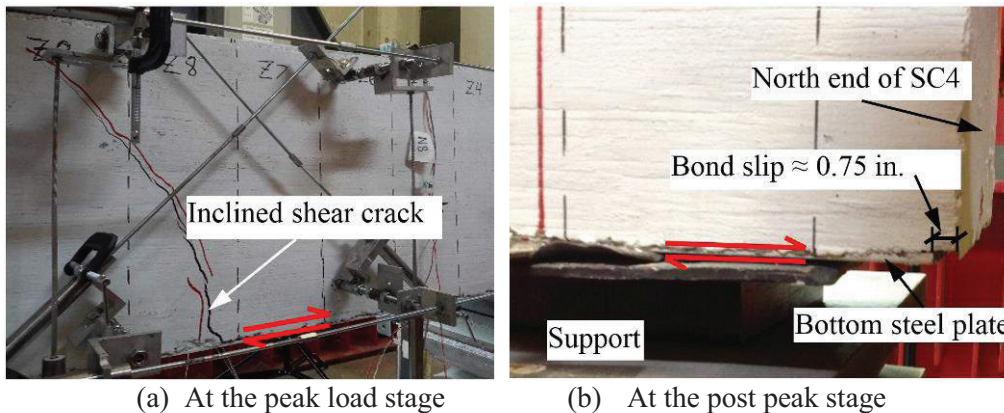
Critical shear crack and bond slip of Specimen SC4 north
